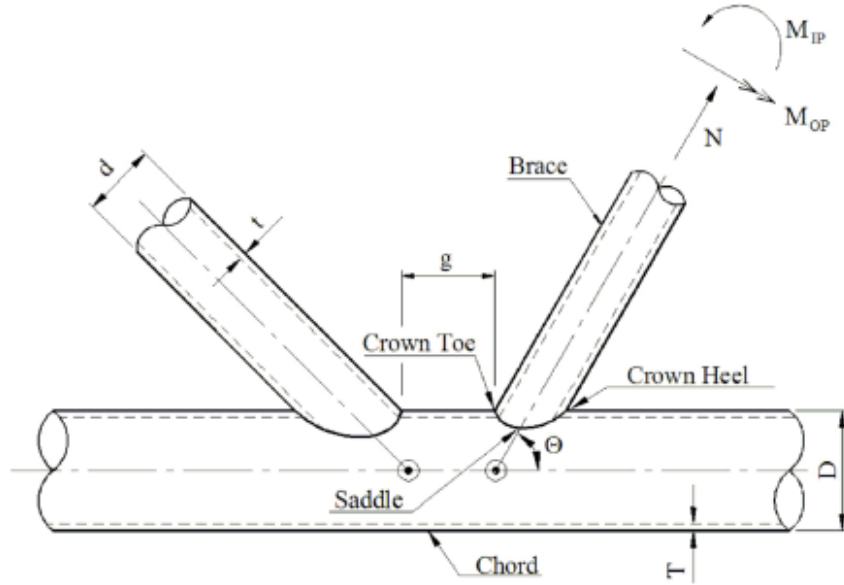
Geometrical definitions for tubular joints, retrieved from [7].
